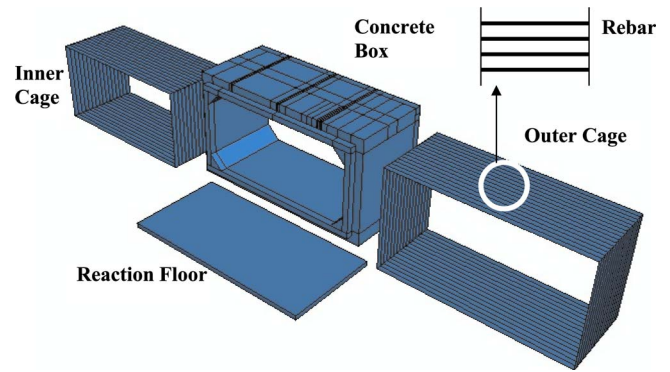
FEM model parts showing inner cage, outer cage of rebar with concrete box, and strong reaction floor
